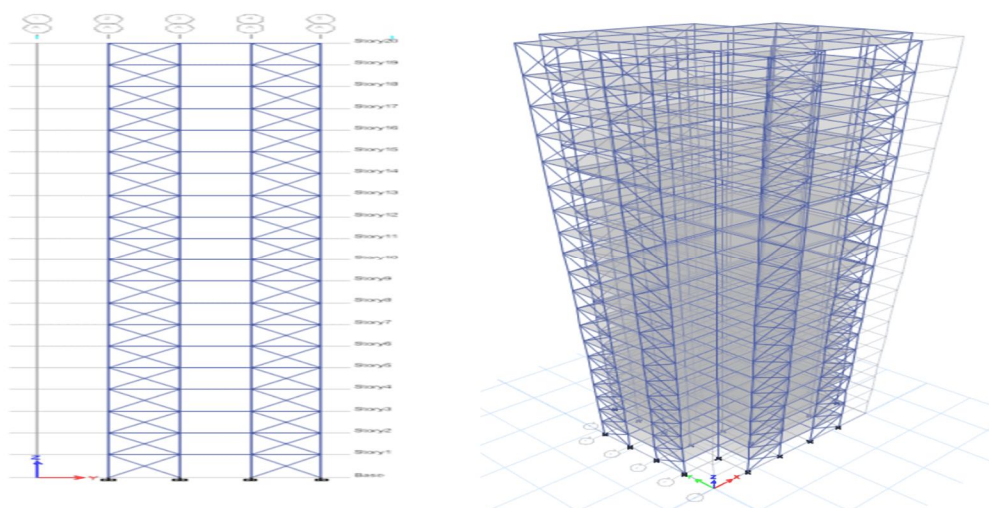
Elevation and 3D view of Irregular building with cross bracings at corners on each side
